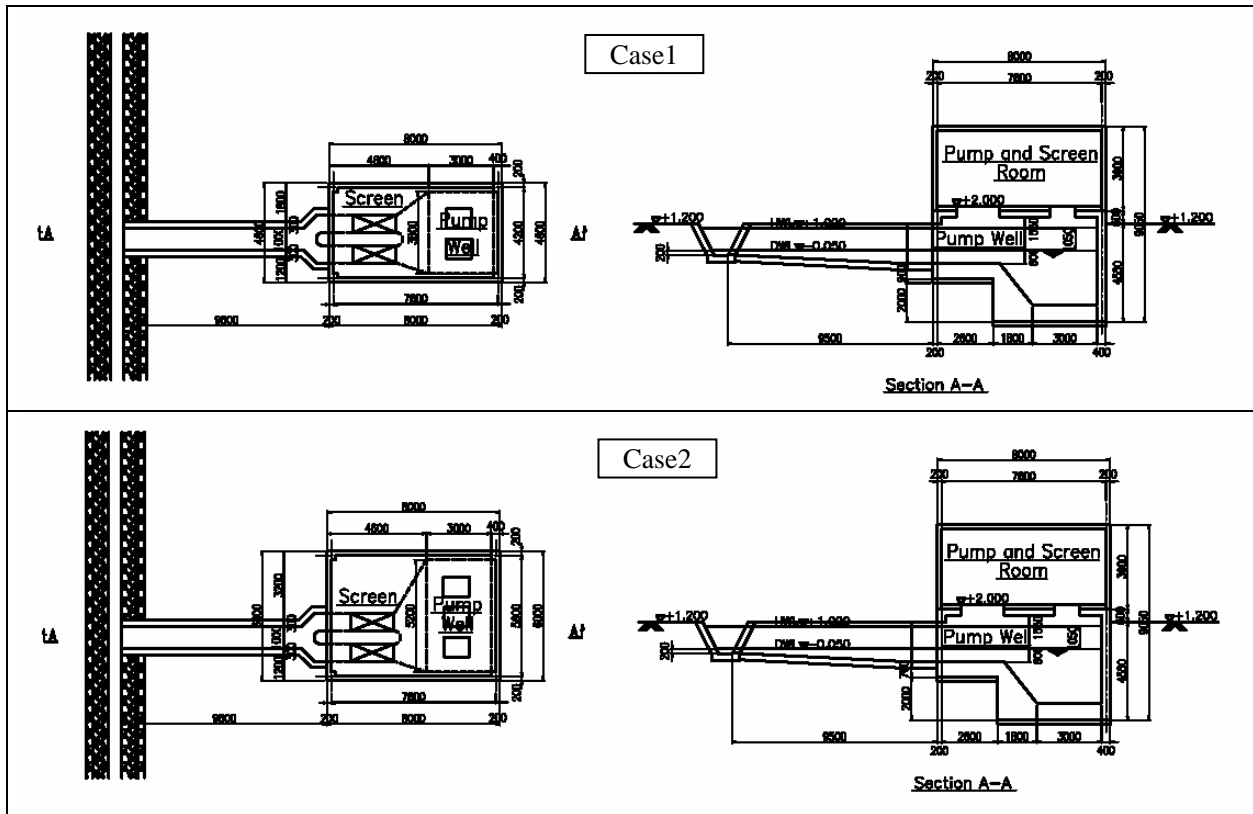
Plan and Section of Raw Water Pump Station
